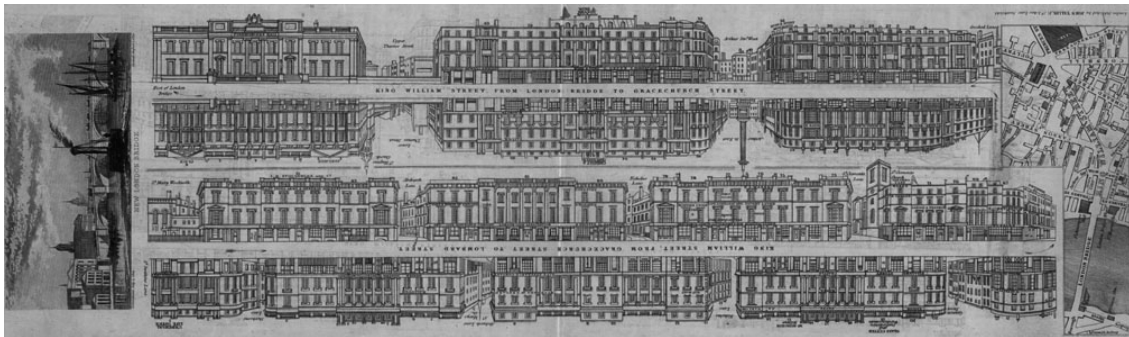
Architectural façade of King William Street as drawn by John Tallis, 1815-1876
